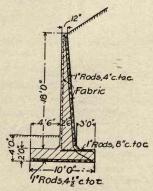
Section of Reinforced Concrete Retaining Wall.
